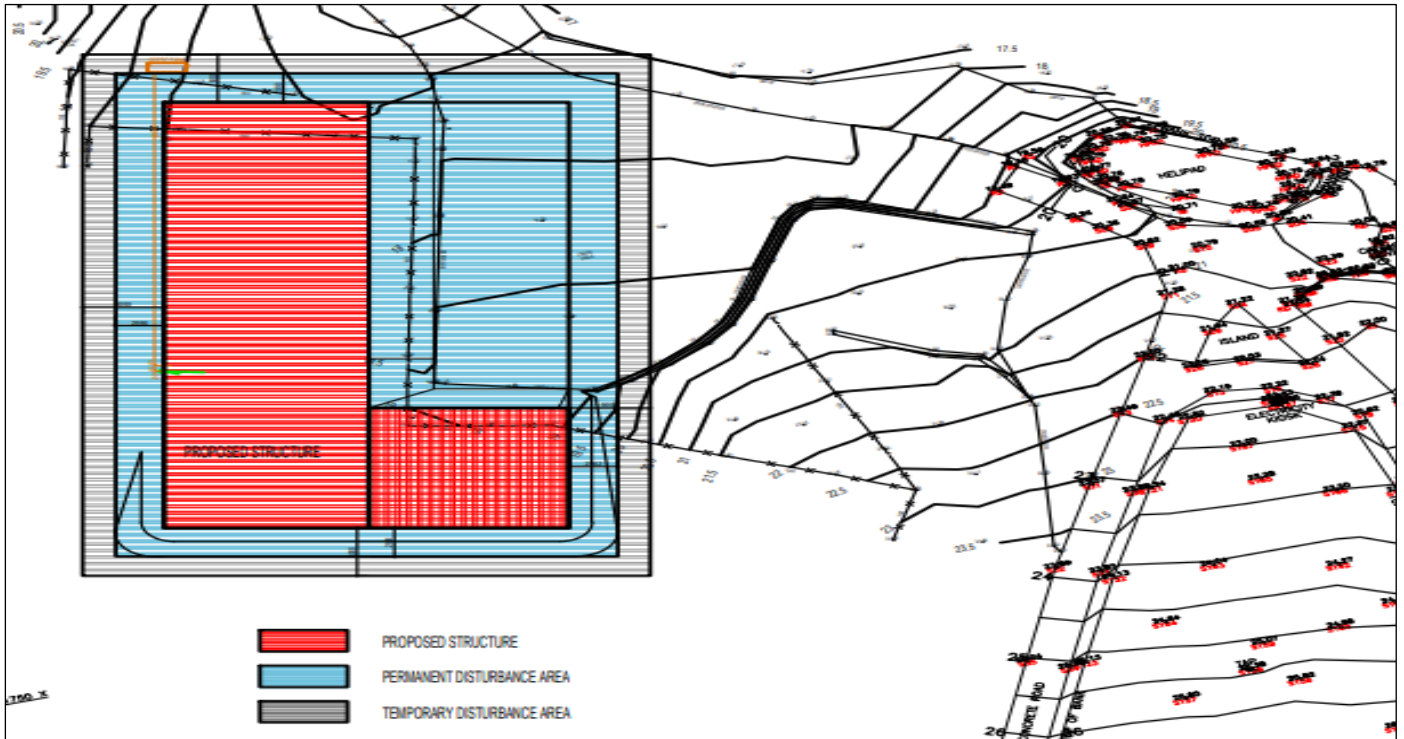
Location of proposed new garages relevant to the previously disturbed area (TMBA, 2024)
